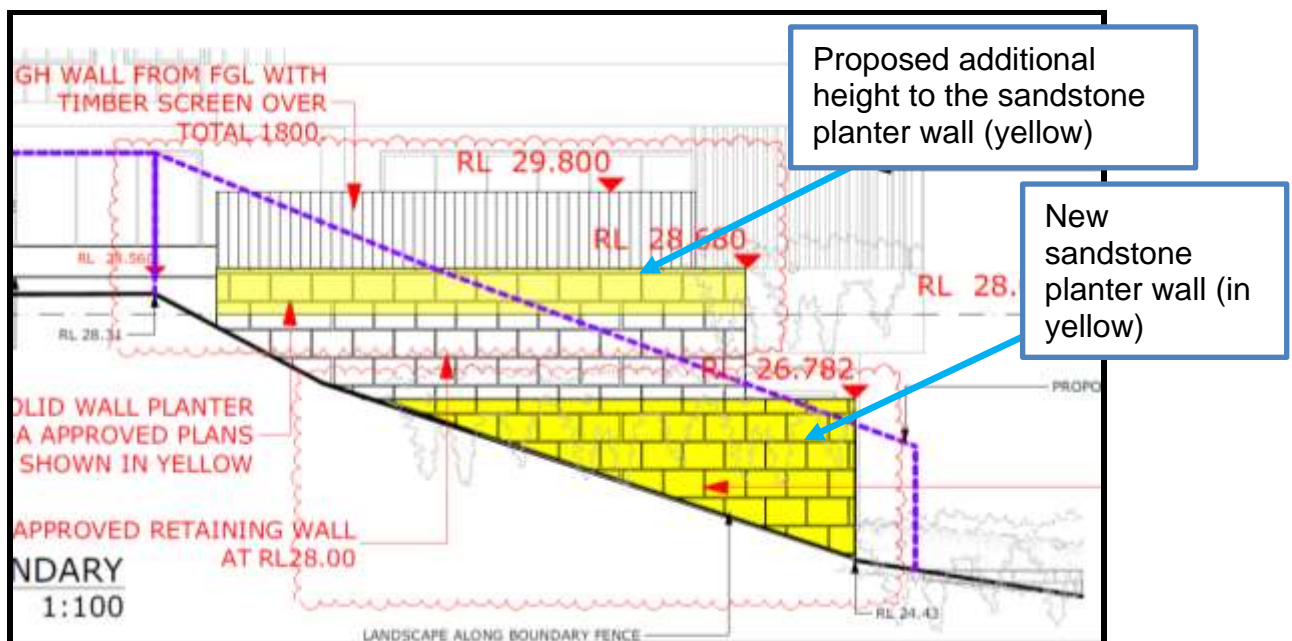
Proposed Retaining wall – Northern elevation (Source: Issue L - David DeChiara, 24/5/2022)
